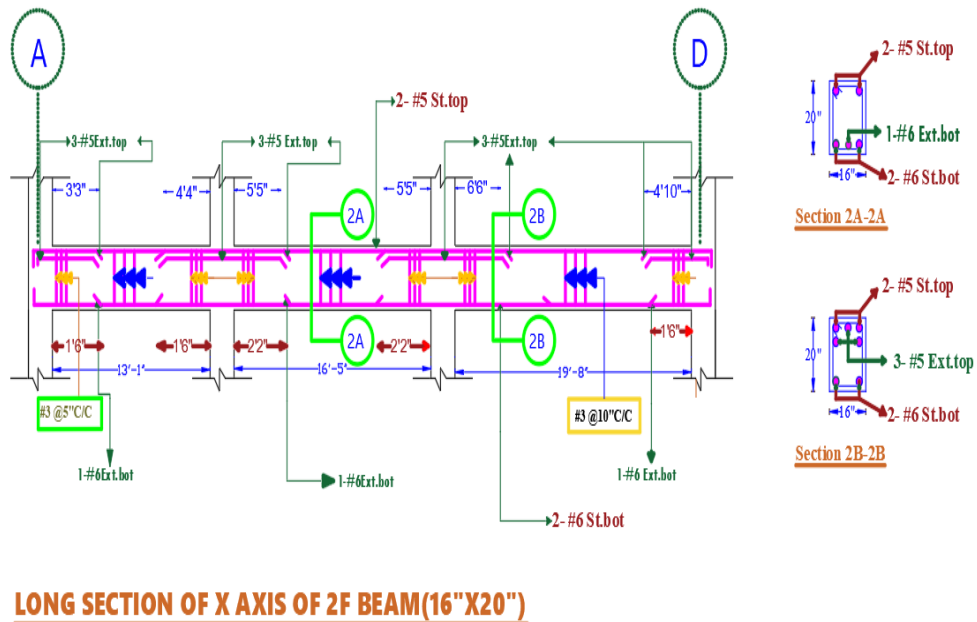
Long and Cross Sections of X Axis of 2<sup>ND</sup> Floor Beam (16" X 20")
